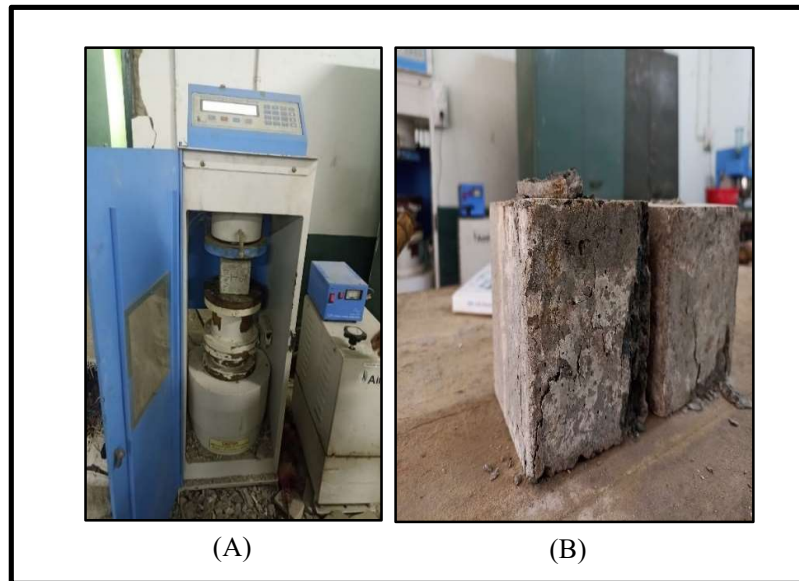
(A) Universal Compressive Testing Machine (B) Collapsed and broken cube
